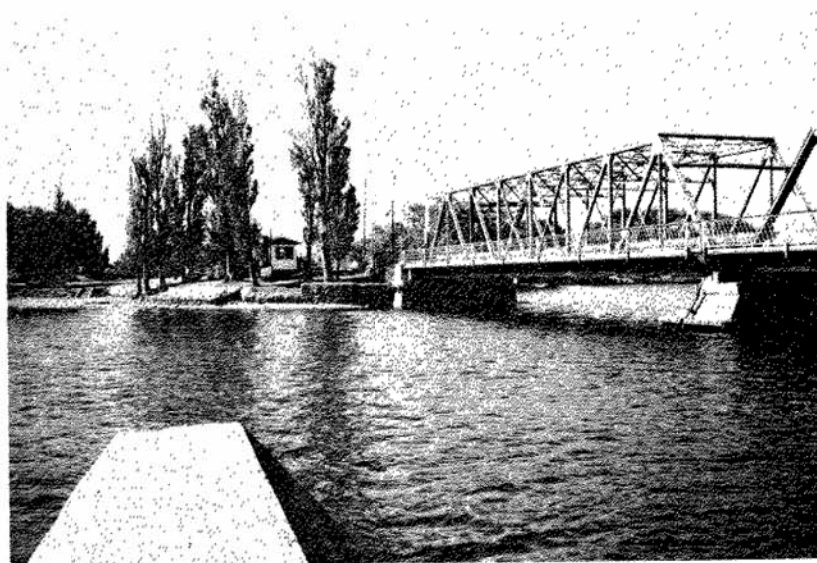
(LOOKING SOUTH FROM EAST SWING STOP PIER)
